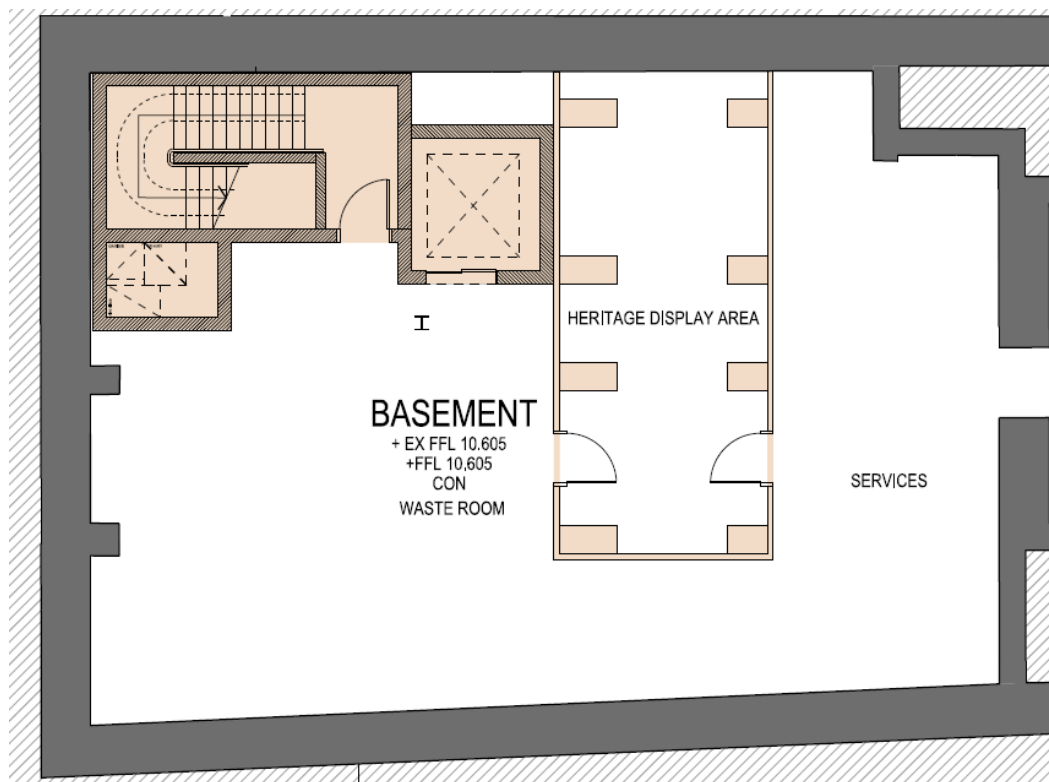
Part plan of the proposed basement level showing heritage display area (visible through glass floor on ground level pictured at Figure 19)
